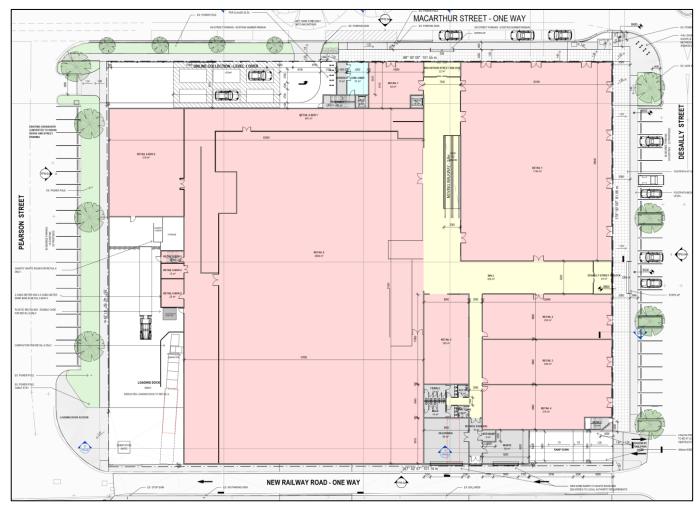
Ground Floor - Development Plan excerpt (Source: ThextonSmith)
